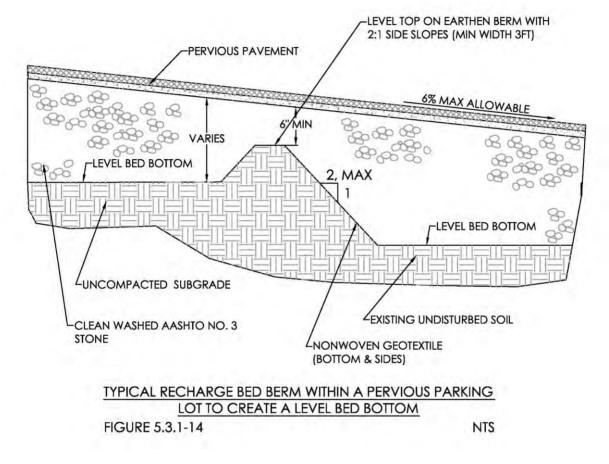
Berms can be used within a pervious pavement bed to create level infiltration areas within a single infiltration bed.
